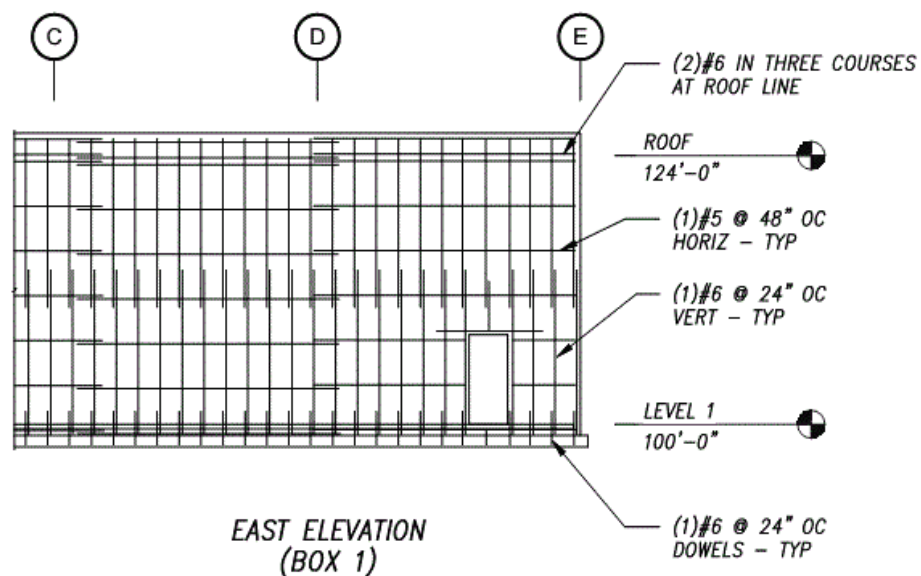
Single-story retail/industrial/warehouse building East elevation: BOX1.
